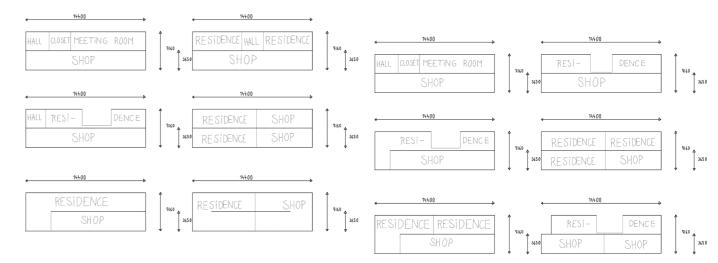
Schematic sketches of the cross-section of the building sections adjacent to the exterior façade of the building.
